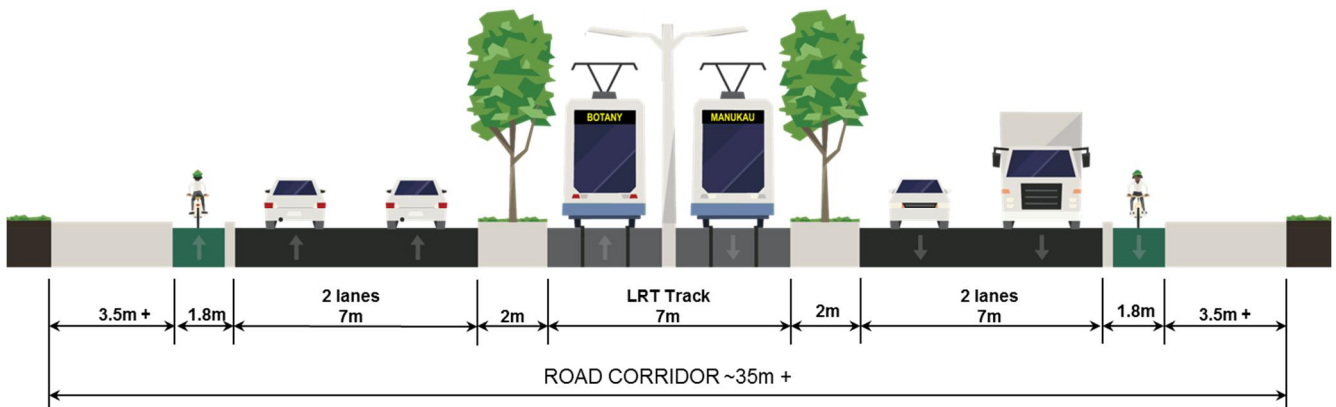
Te Irirangi Drive - typical cross section north of Whetstone Road
